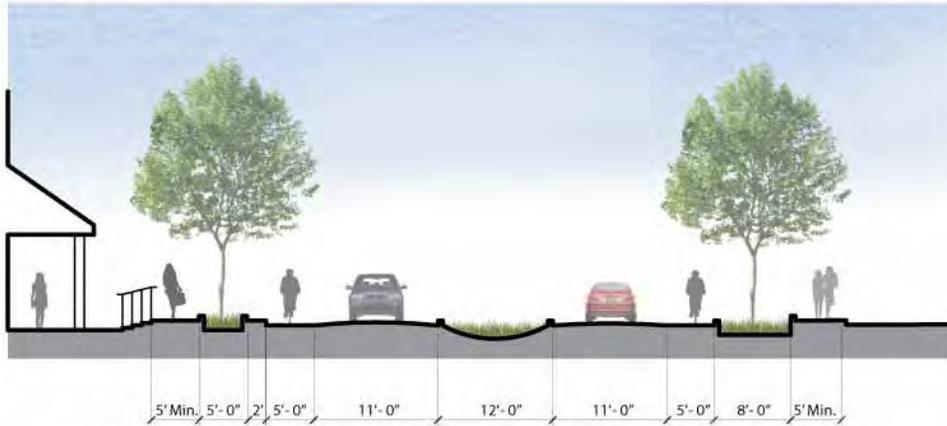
Typical MD 725/ Marlboro Pike Street Section with Median and Plan
